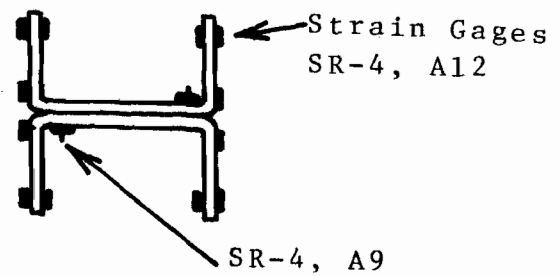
STUB-COLUMN TEST SPECIMEN
